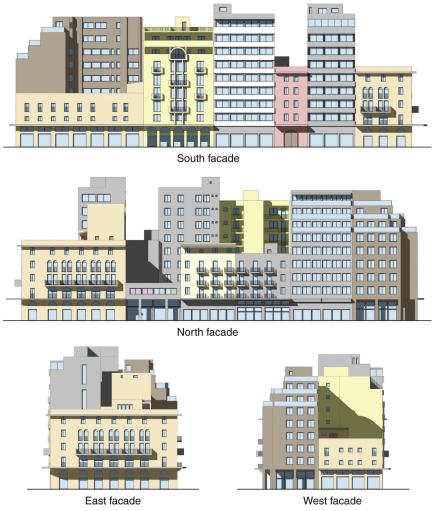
Buildings' elevations - south, north, east, and west oriented.
